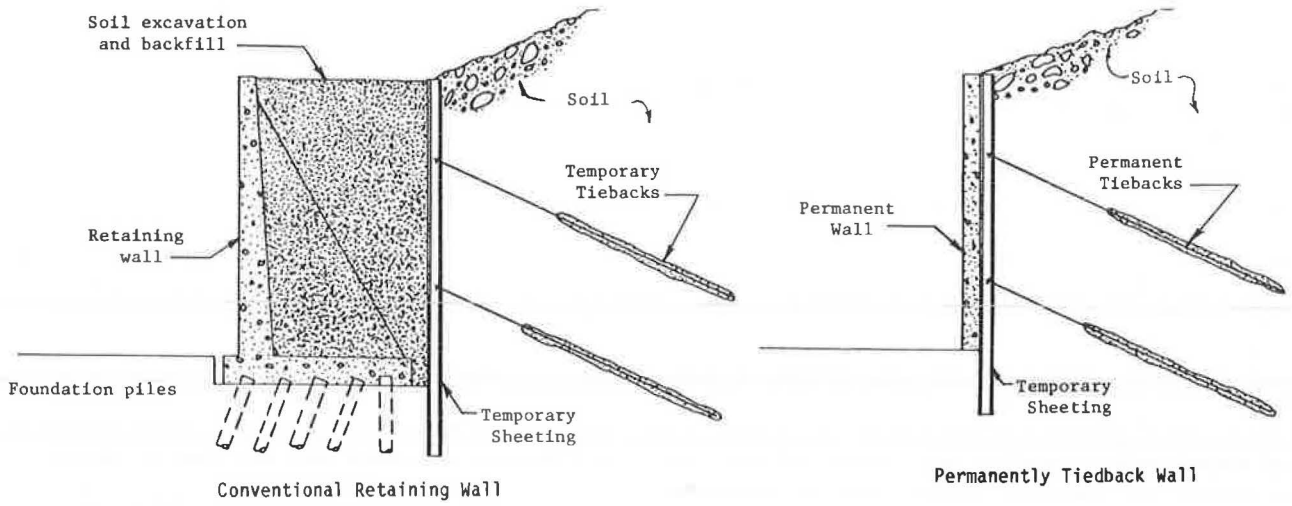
Comparison of conventional retaining wall and tieback wall.
